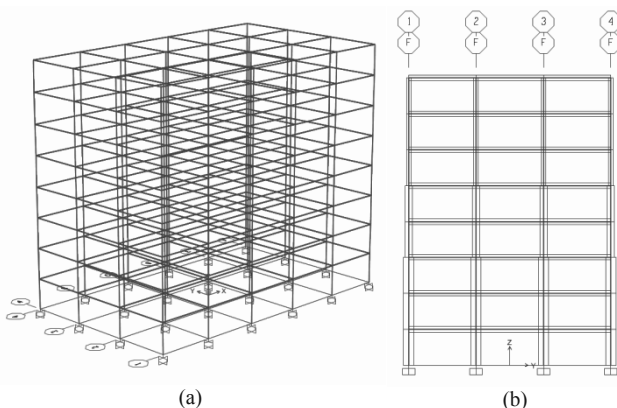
Perspective and section view of RC frame. Note elastic supports added to base of columns.
